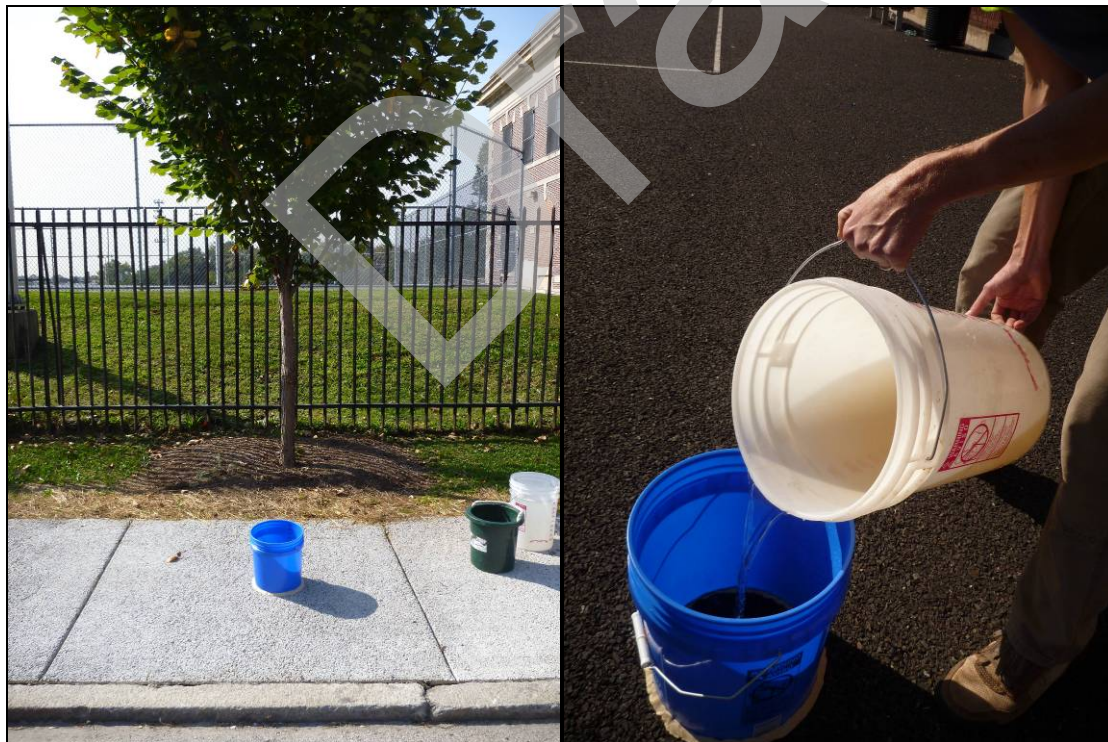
Pervious Paving Infiltration Testing Procedure
